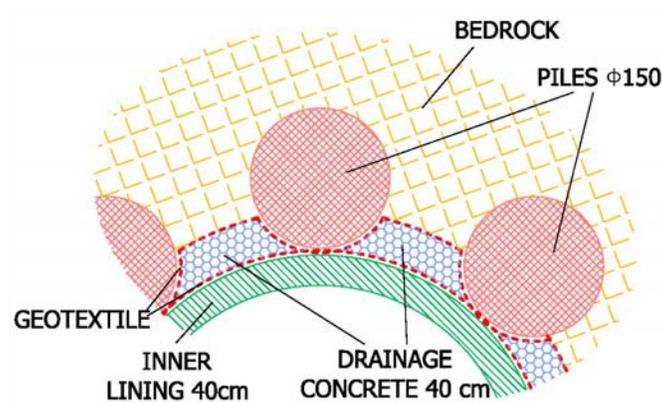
The detail of embedded draining concrete into the primary and secondary coating of the RC well.
